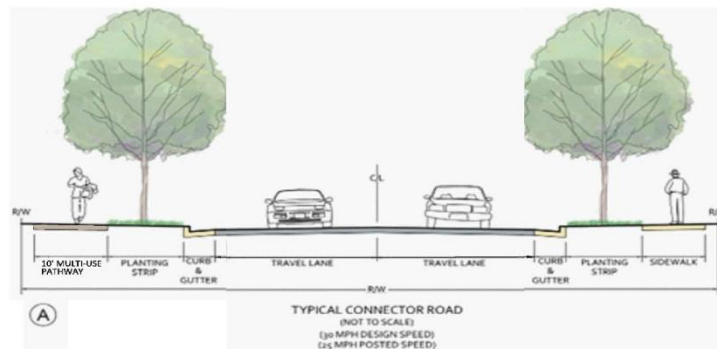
CONNECTOR ROAD CROSS SECTION
